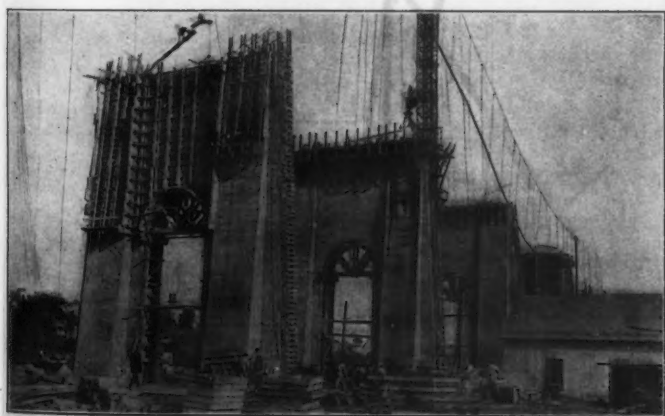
CONSTRUCTION OF CONCRETE PIERS ON LONG ISLAND.
